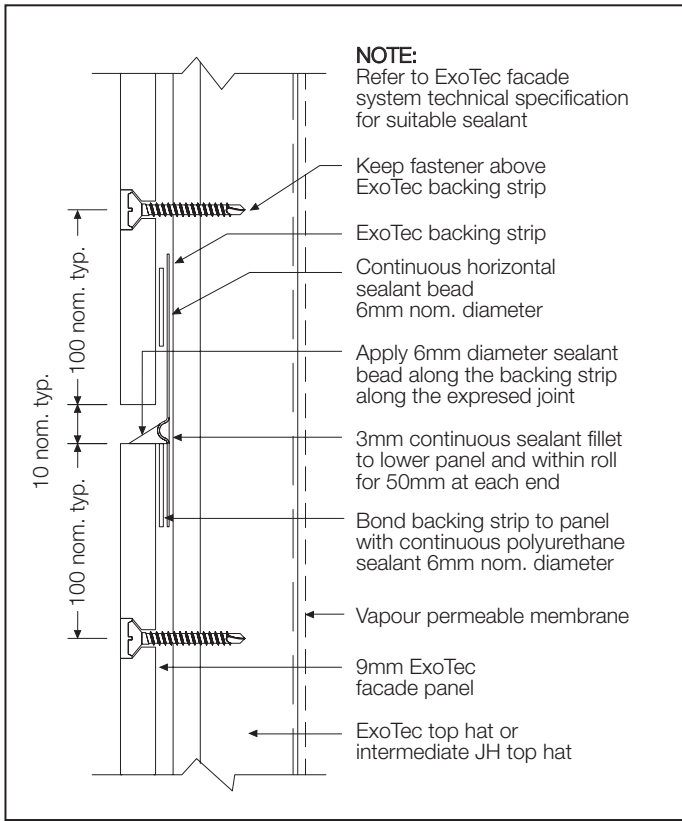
HORIZONTAL PANEL JOINT DETAIL
